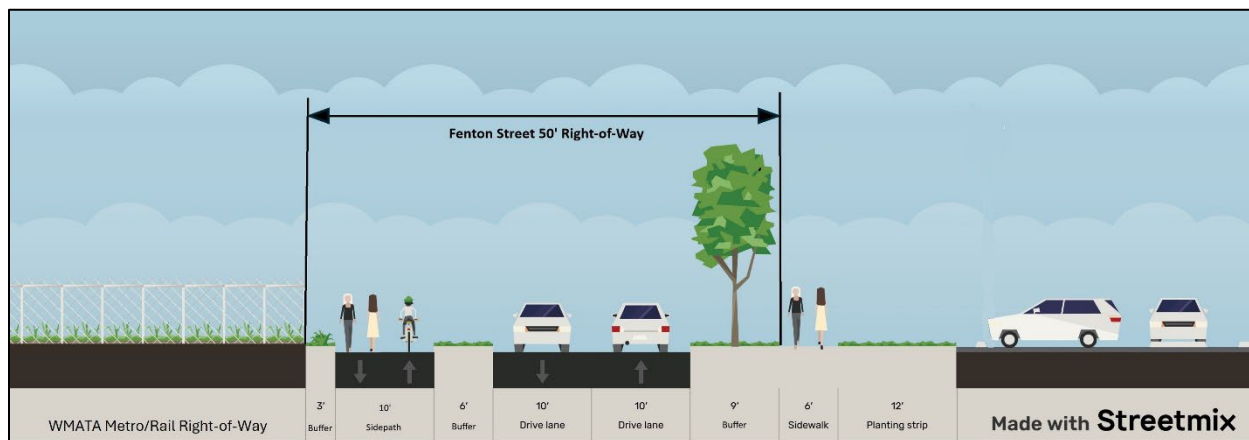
Existing Cross Section - Fenton Street (Station 67+00) - Looking North
